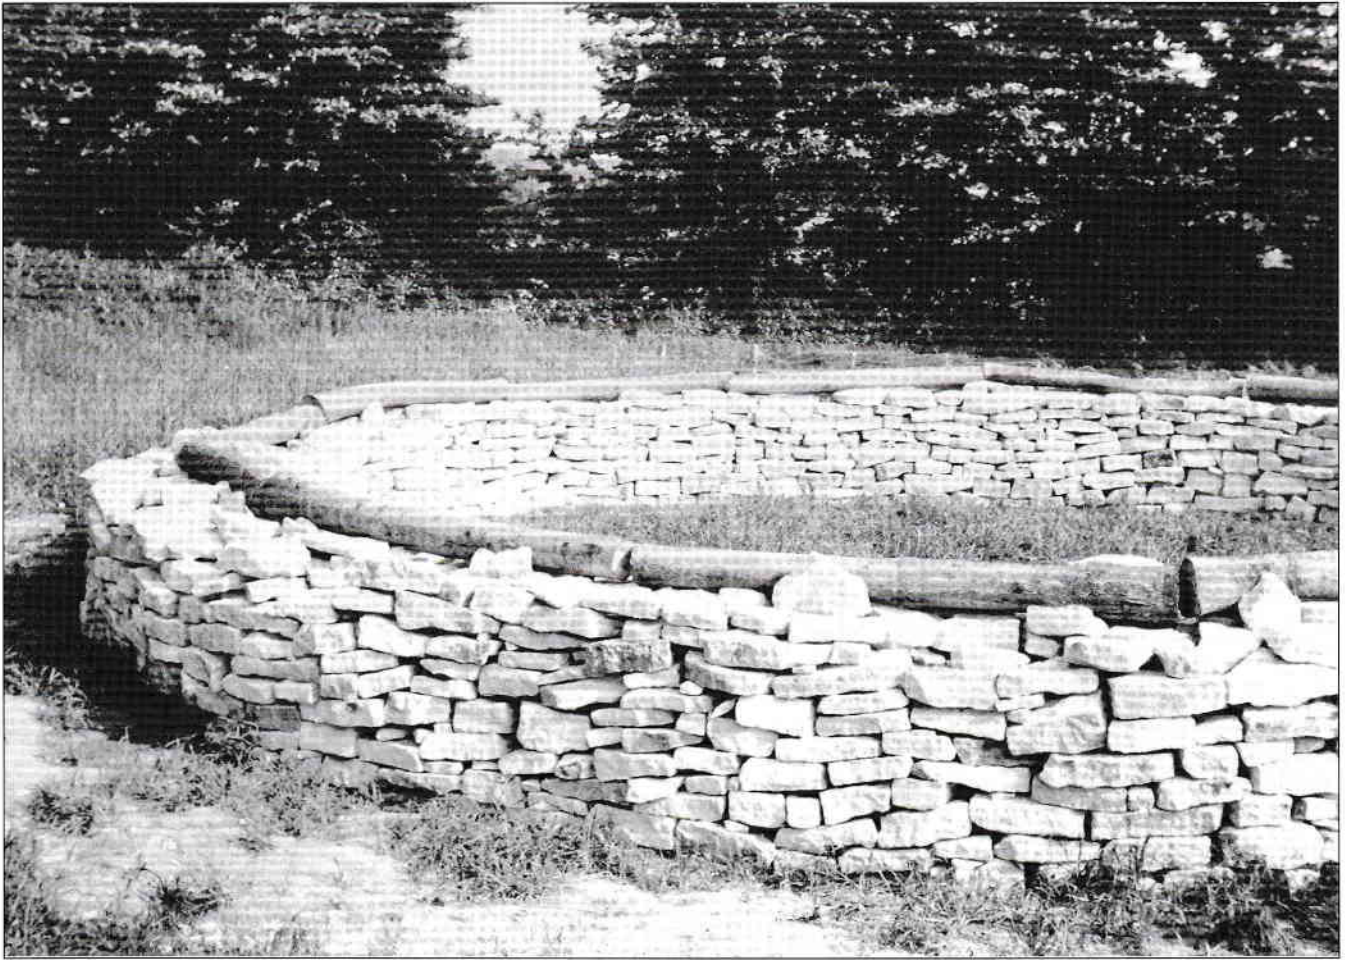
Avoncroft Museum of Buildings. Conderton construct, wall completed, ring beam in position secured by upright stones bedded into wall top. Easter 1970. Photograph: Peter Reynolds
